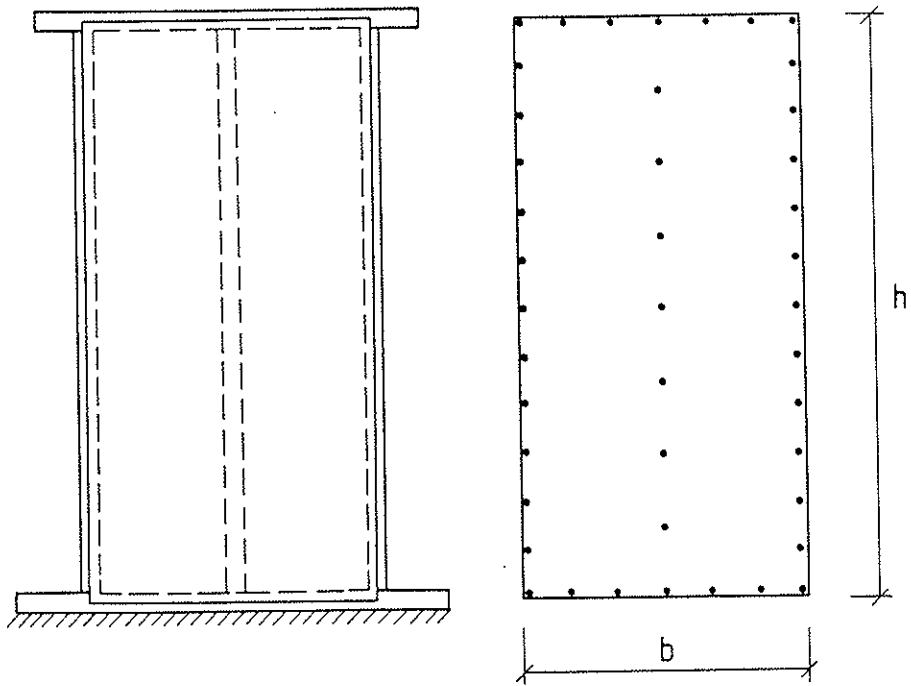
Wall unit consisting of a sheet fastened to a vertical timber frame.
